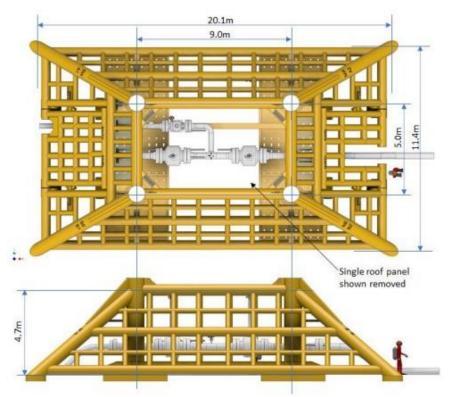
Victory Pigging Skid Layout and Protection Structure
